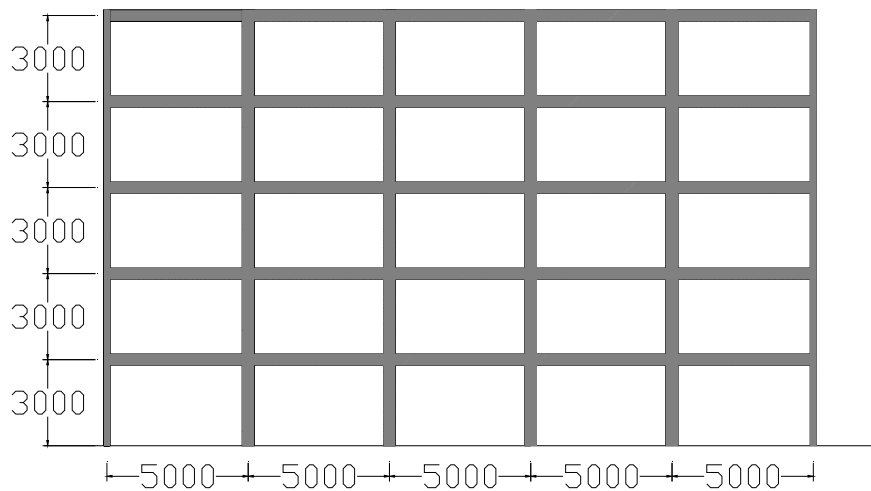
Elevation of building model 1 used for this study (dimension is in mm)
